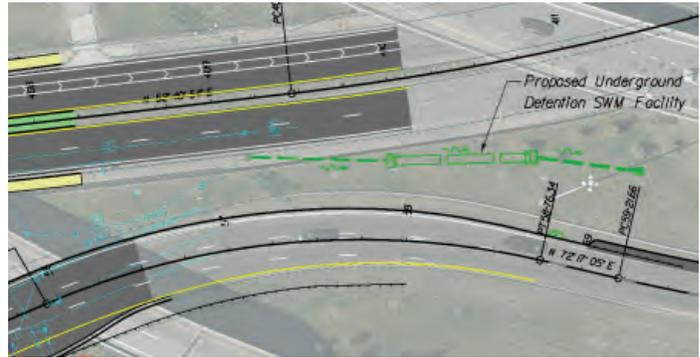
Proposed Stormwater Detention Facility
